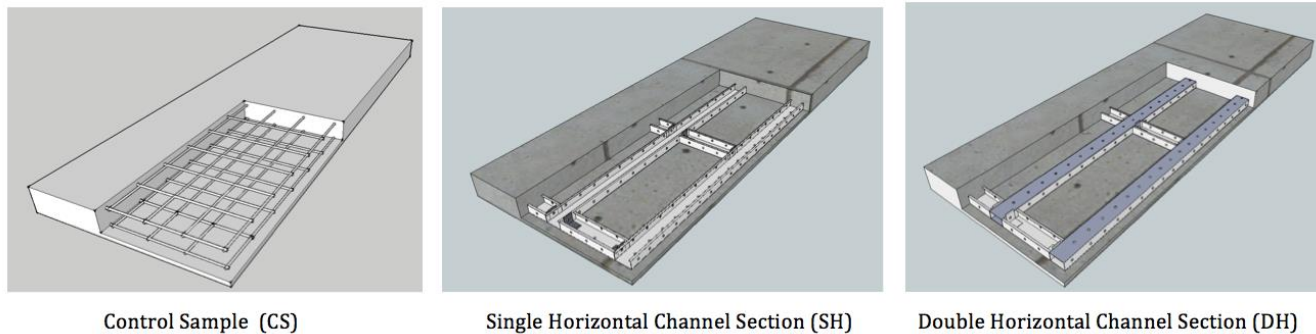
The cross sectional view of the three types of slab reinforcement configuration
